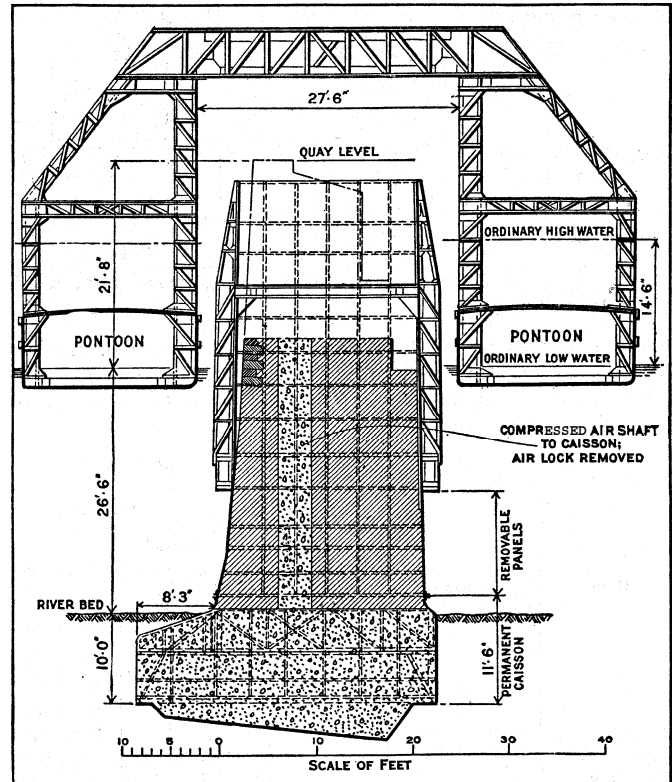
SECTION OF QUAY WALL IN THE RIVER SCHELDT. ANTWERP, 1903. FOUNDED ON CAISSONS SUNK BY COMPRESSED AIR
